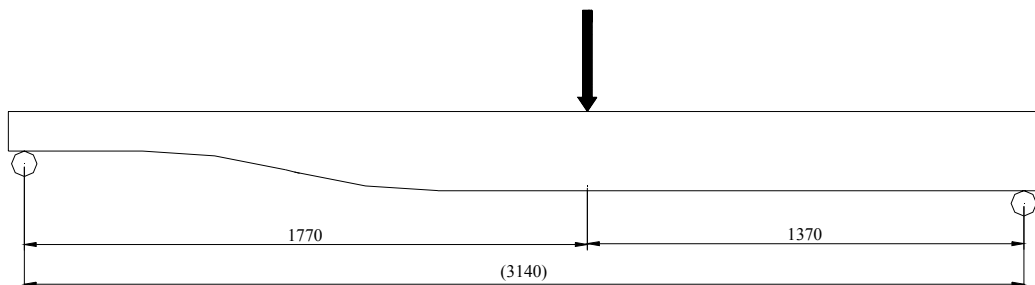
Loading Configuration for Half-Scale Neck Beam
